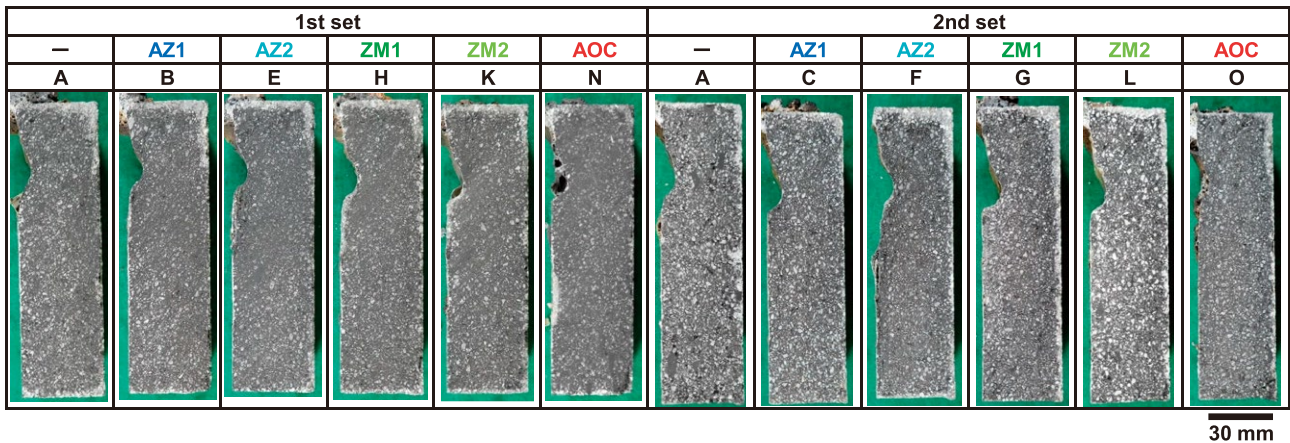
Appearance of cross section of the selected specimens after corrosion tests of 1st and 2nd set.
